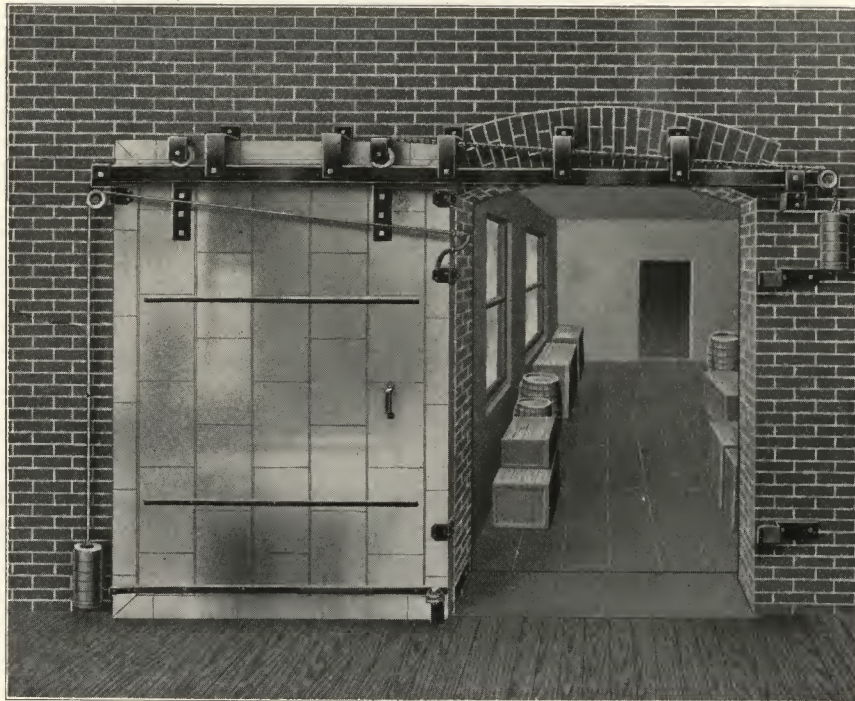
No. 304 Fire Door Fixtures Applied to Left Hand Tin Clad Fire Door
